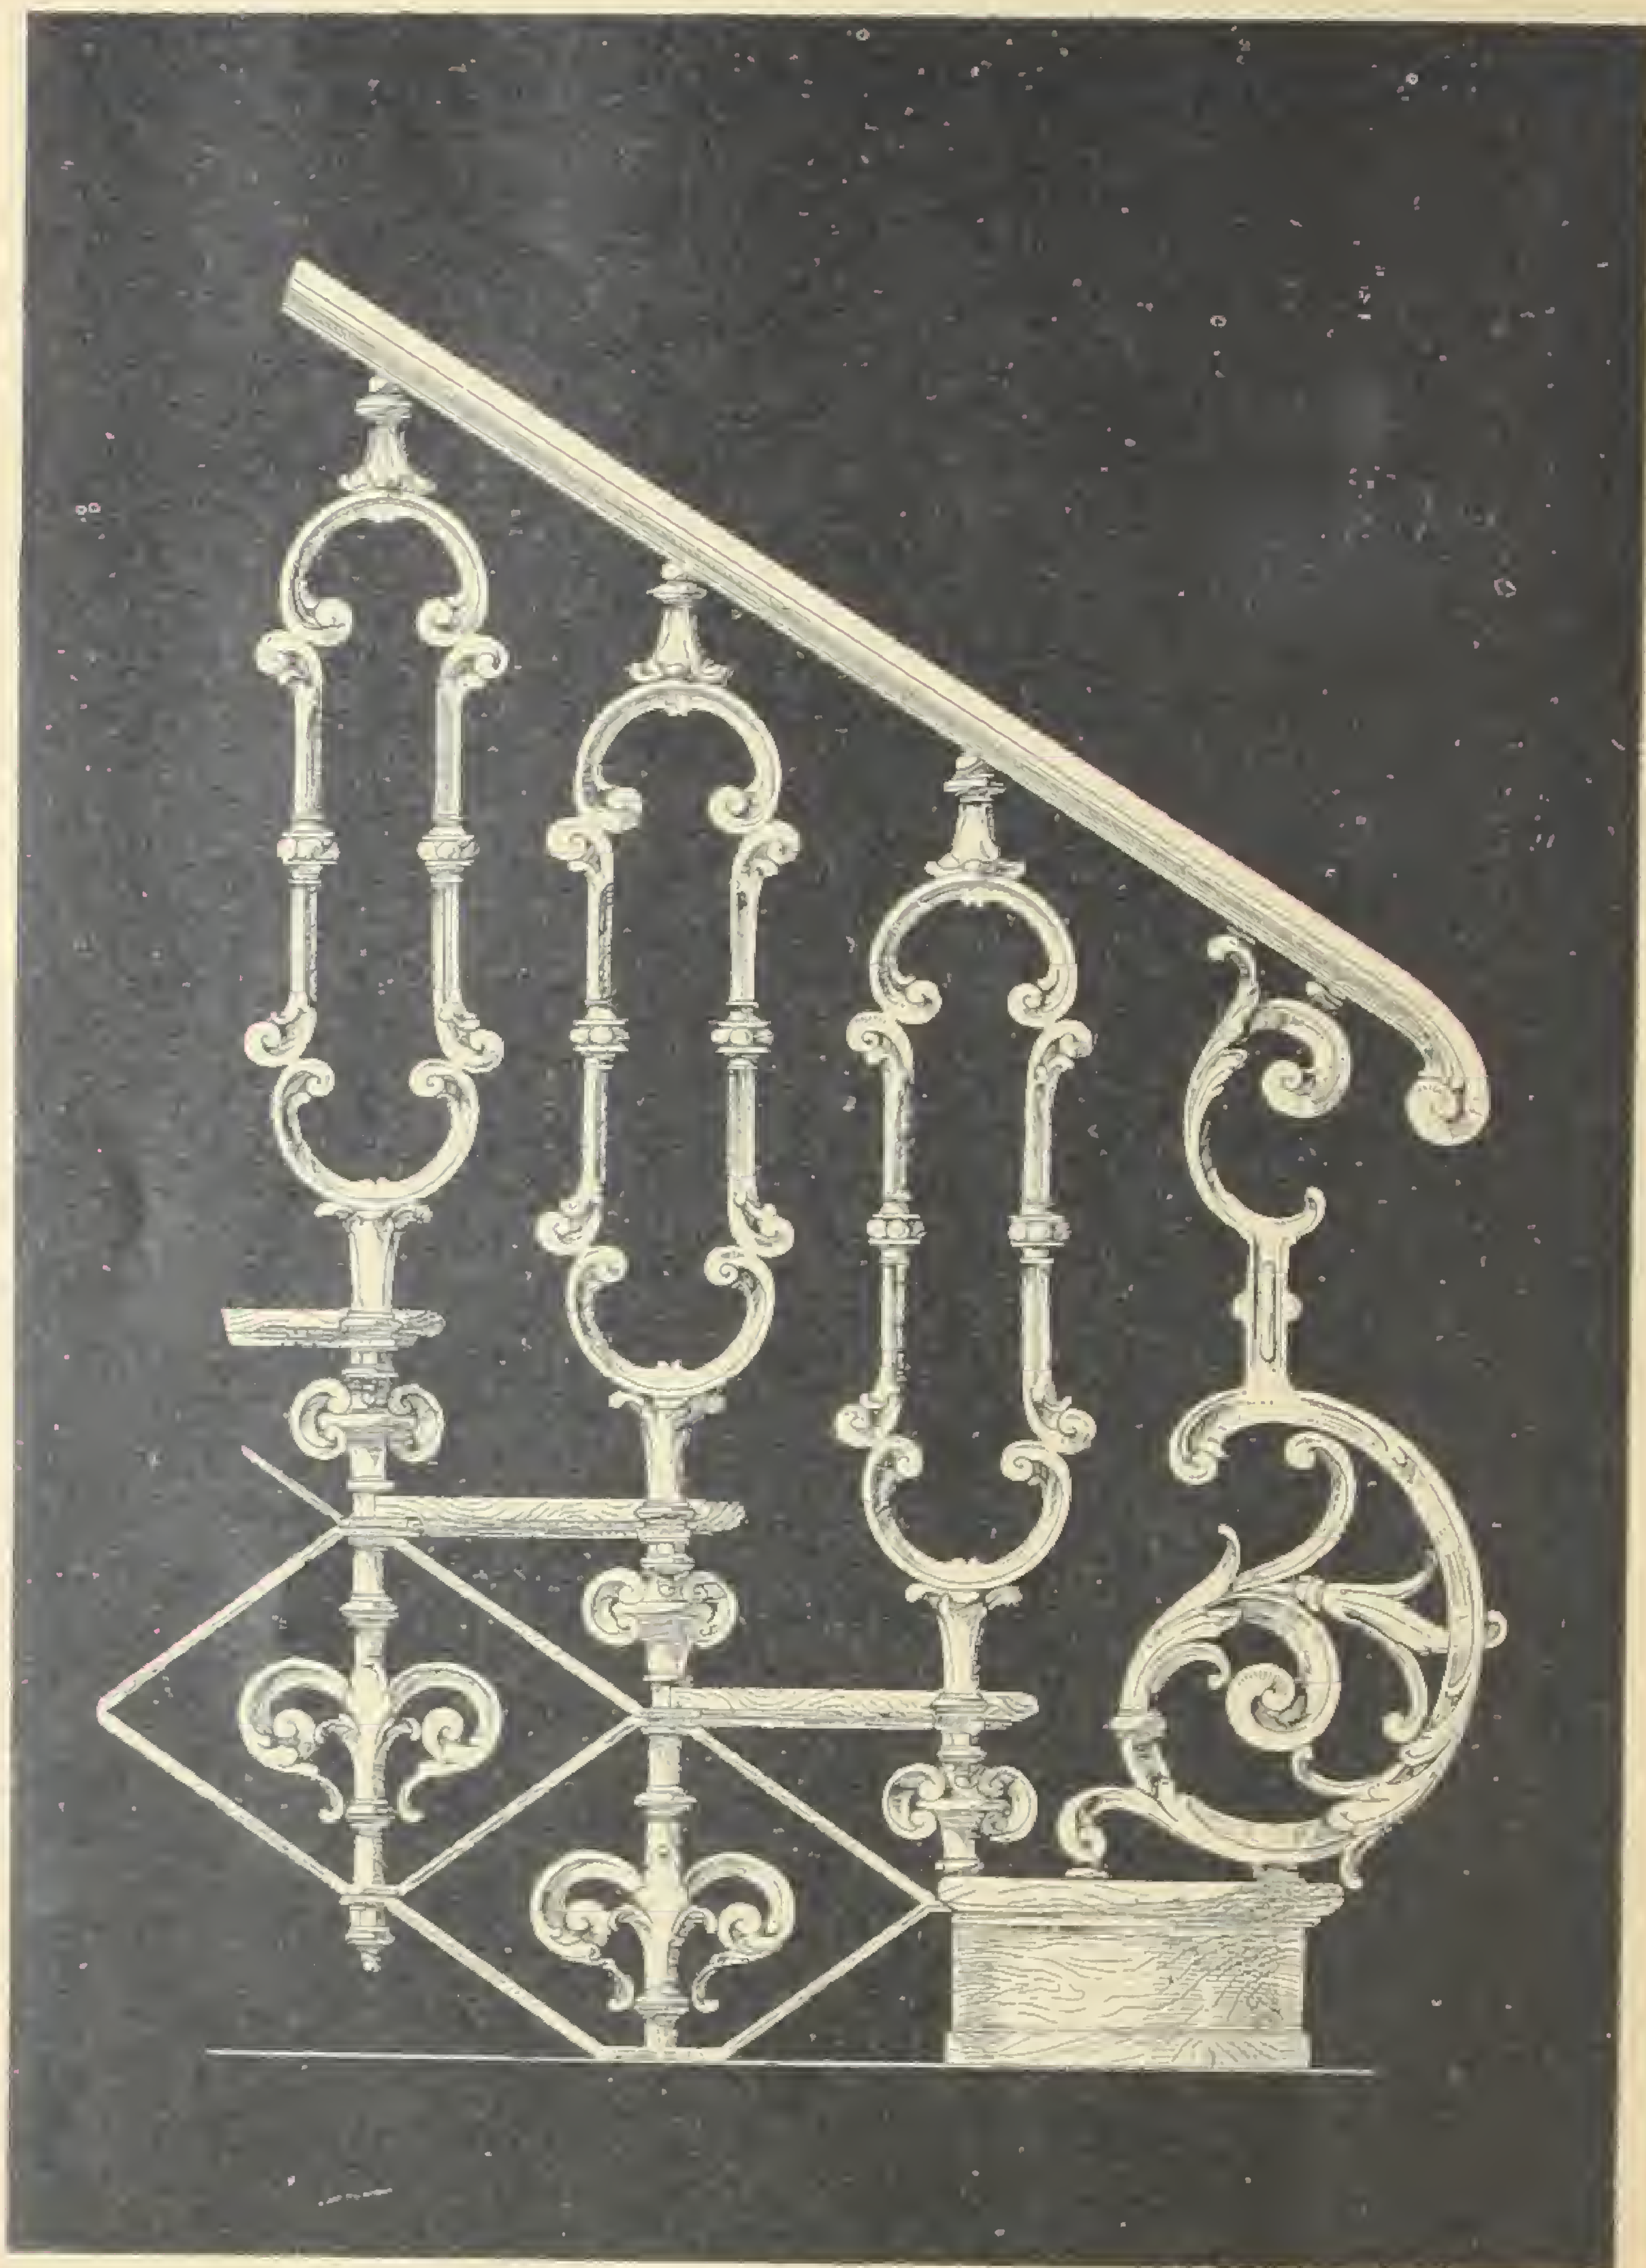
Joly's patent fireproof stairs for small dwellings, schools, etc.
